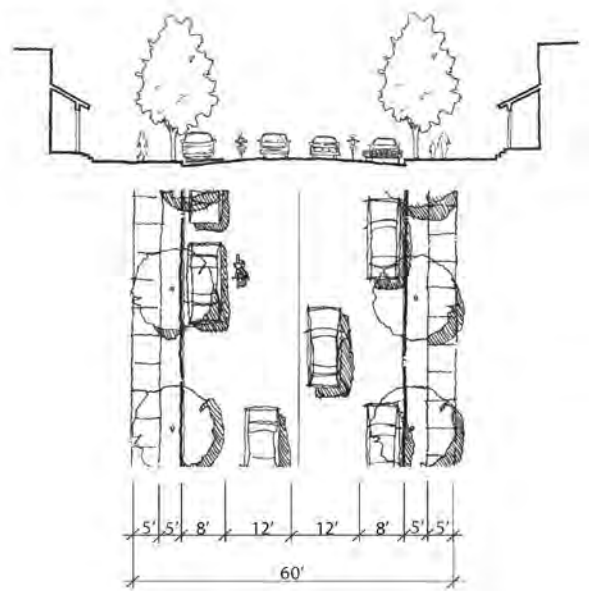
G - STREET SECTIONS - FORD BOULEVARD
